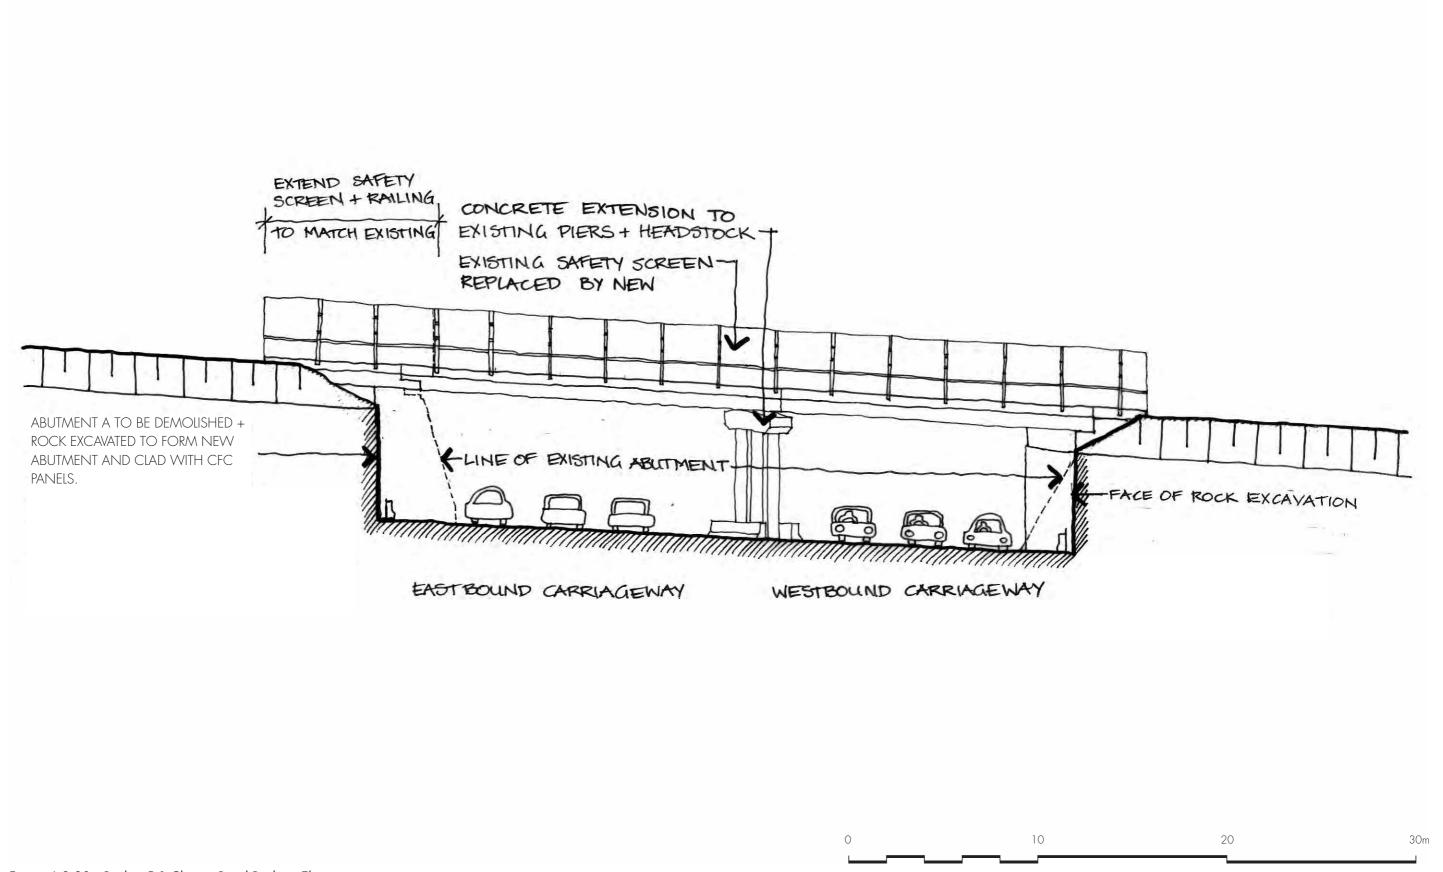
Bridge 5.1 Christie Road Bridge - Elevation
